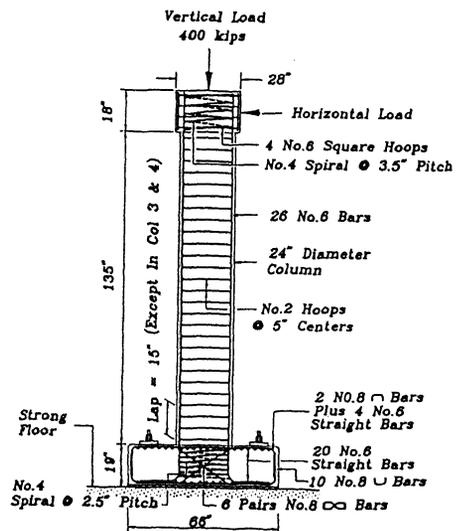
Details for Circular Flexural Column (1 in = 25.4 mm)
